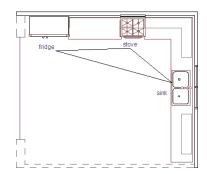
Three dimensional-U- Shape kitchen layout Image: Phelix Kirk
